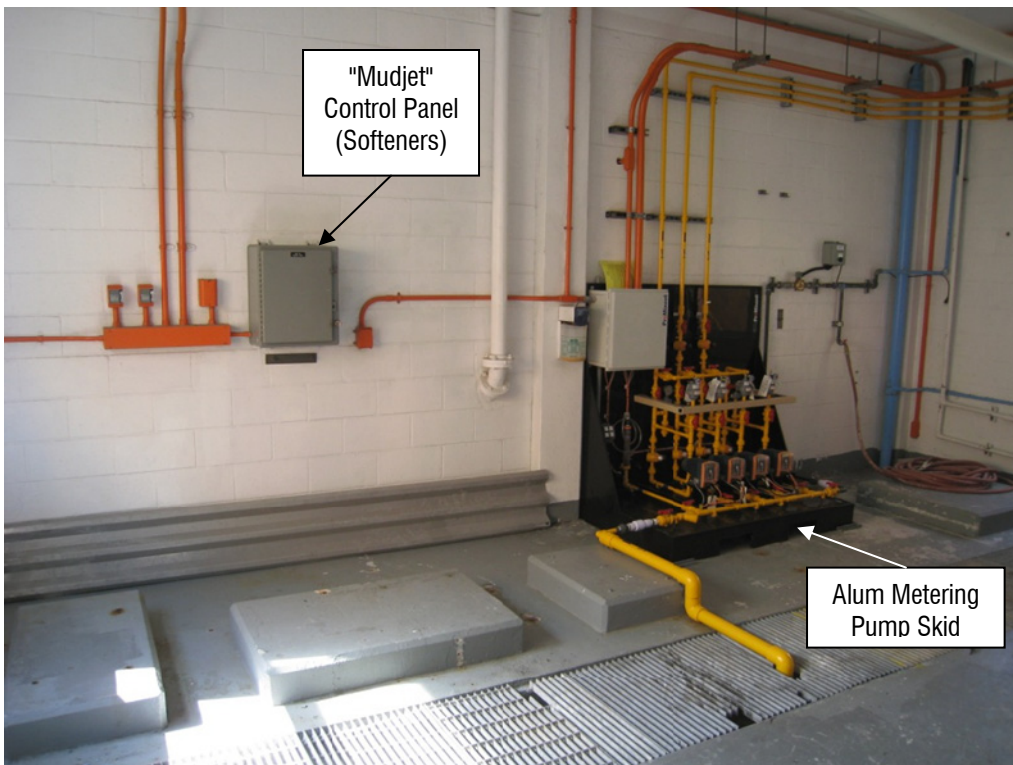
Lime Slaker Room - 3rd Floor South Chemical Building (Northwest view)
